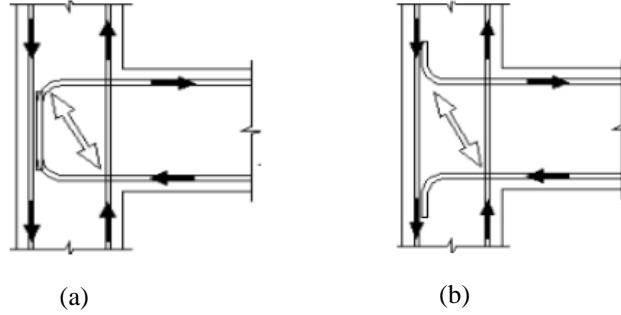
Types of beam-column joints (a) Inside hook, and (b) Outside hook [7].
